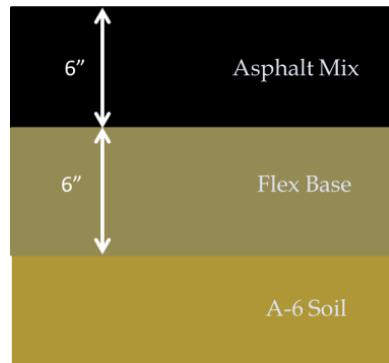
Pavement Cross Section from PerRoad Express Example in Chapter 4.
